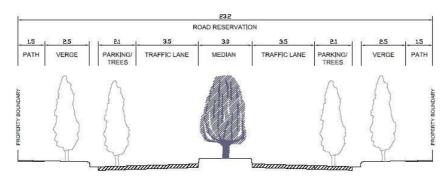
(c) Port Sorell and Environs Street Cross-section designs - Alexander Street, South of Hawk Hill Road
